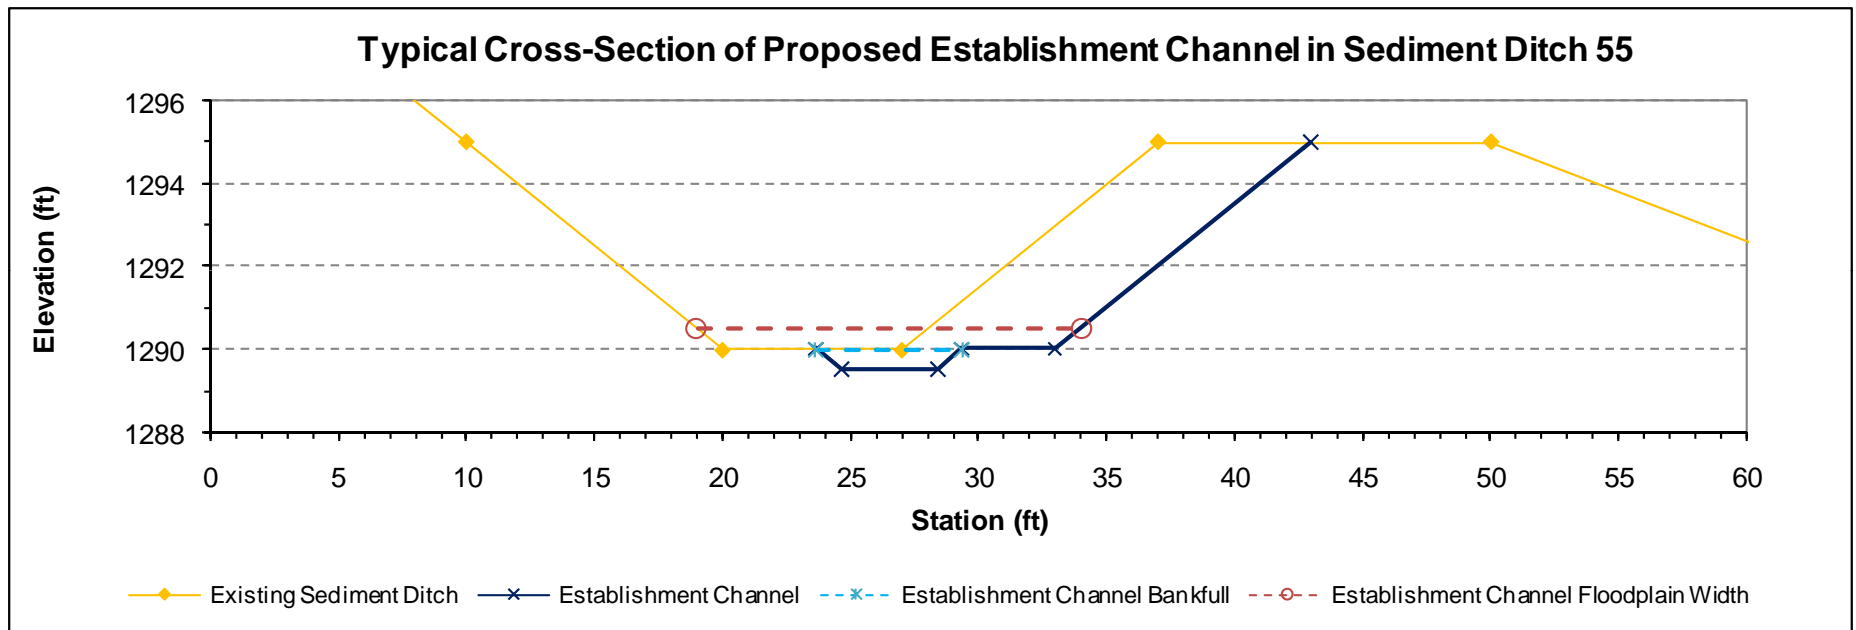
Typical Cross-Section of Proposed Establishment Channel in Sediment Ditch 55 (requires additional excavation for floodplain)
